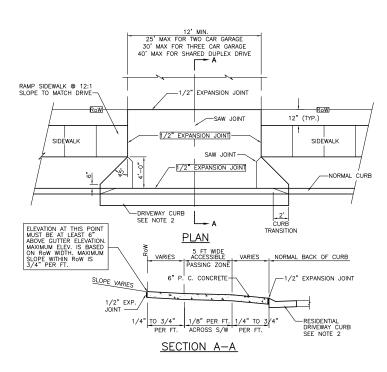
SIDEWALK RAMP WITH GRASS PARKWAY (NOT TO SCALE)
